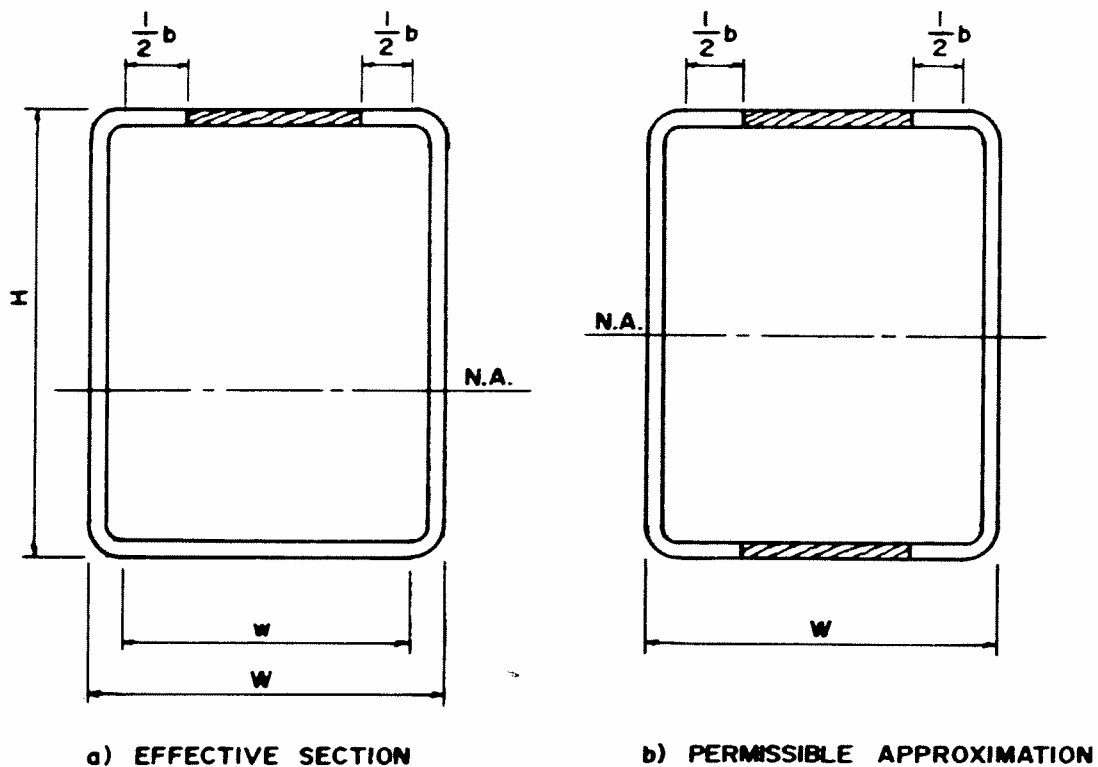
EFFECTIVE SECTION IN THIN WALLED RECTANGULAR TUBES
